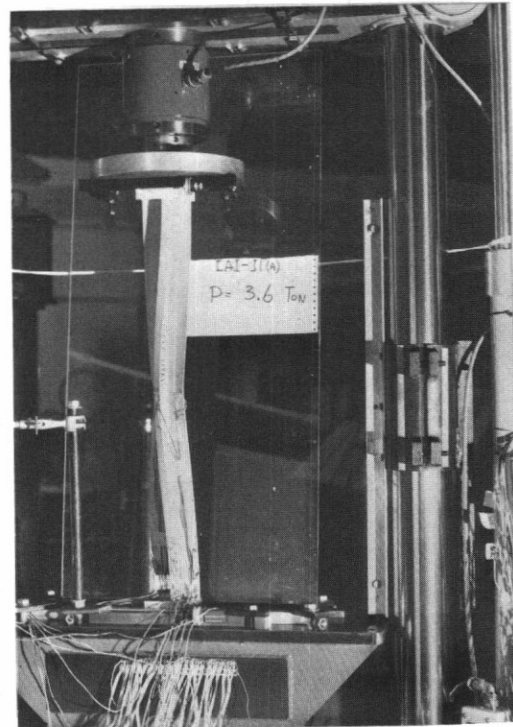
Stiffener deflections, J1, at P=3600 kg., prior to failure.
